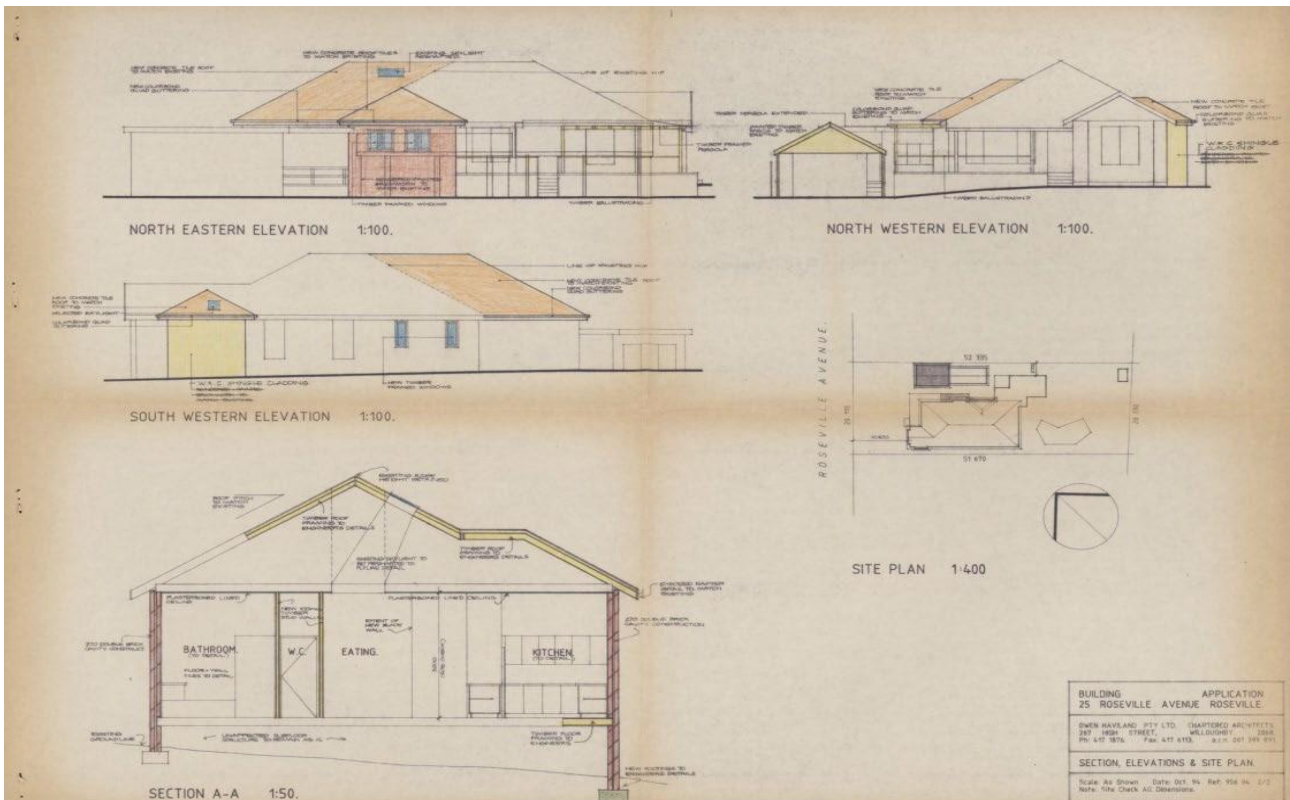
Elevations and Sections indicating ensuite construction and additions to rear dating from 1994
